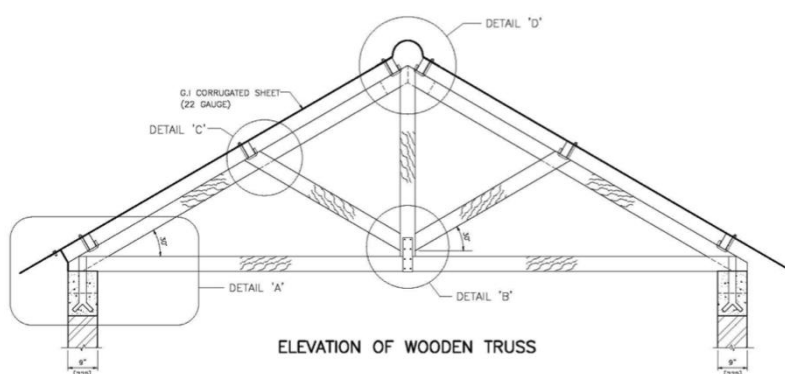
Details of a wooden truss suitable for small spans up to 12 feet, by ERRA
